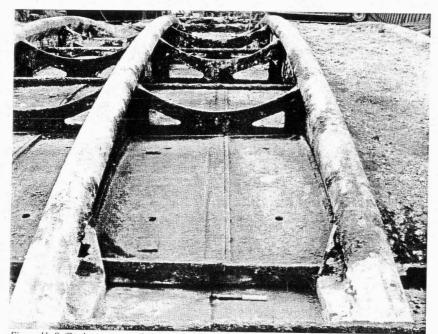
Soffit plates, spacer plates and tie bars of the main span, seen from above (Malcolm Tucker)
